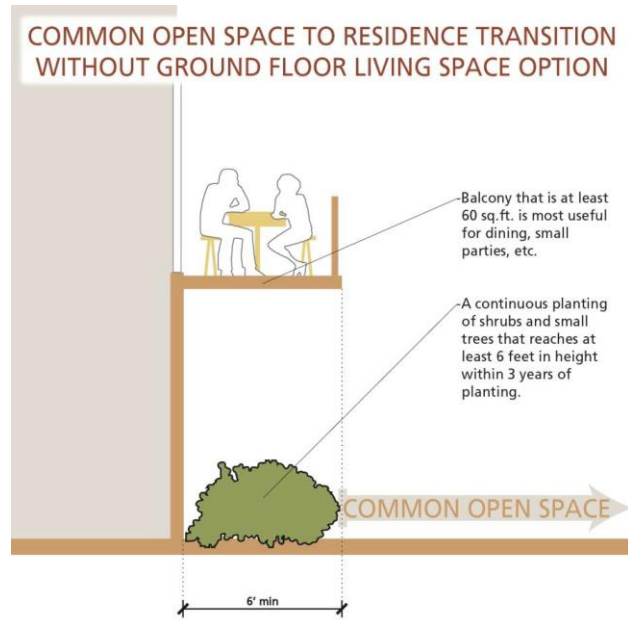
Planting requirements for residences without a ground floor living space fronting a common open space.
